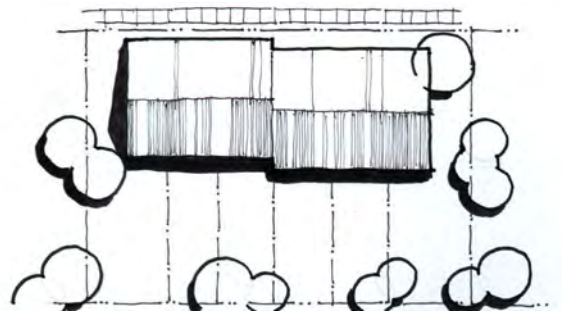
All townhouse units shall have private yard areas of at least 400 square feet.
